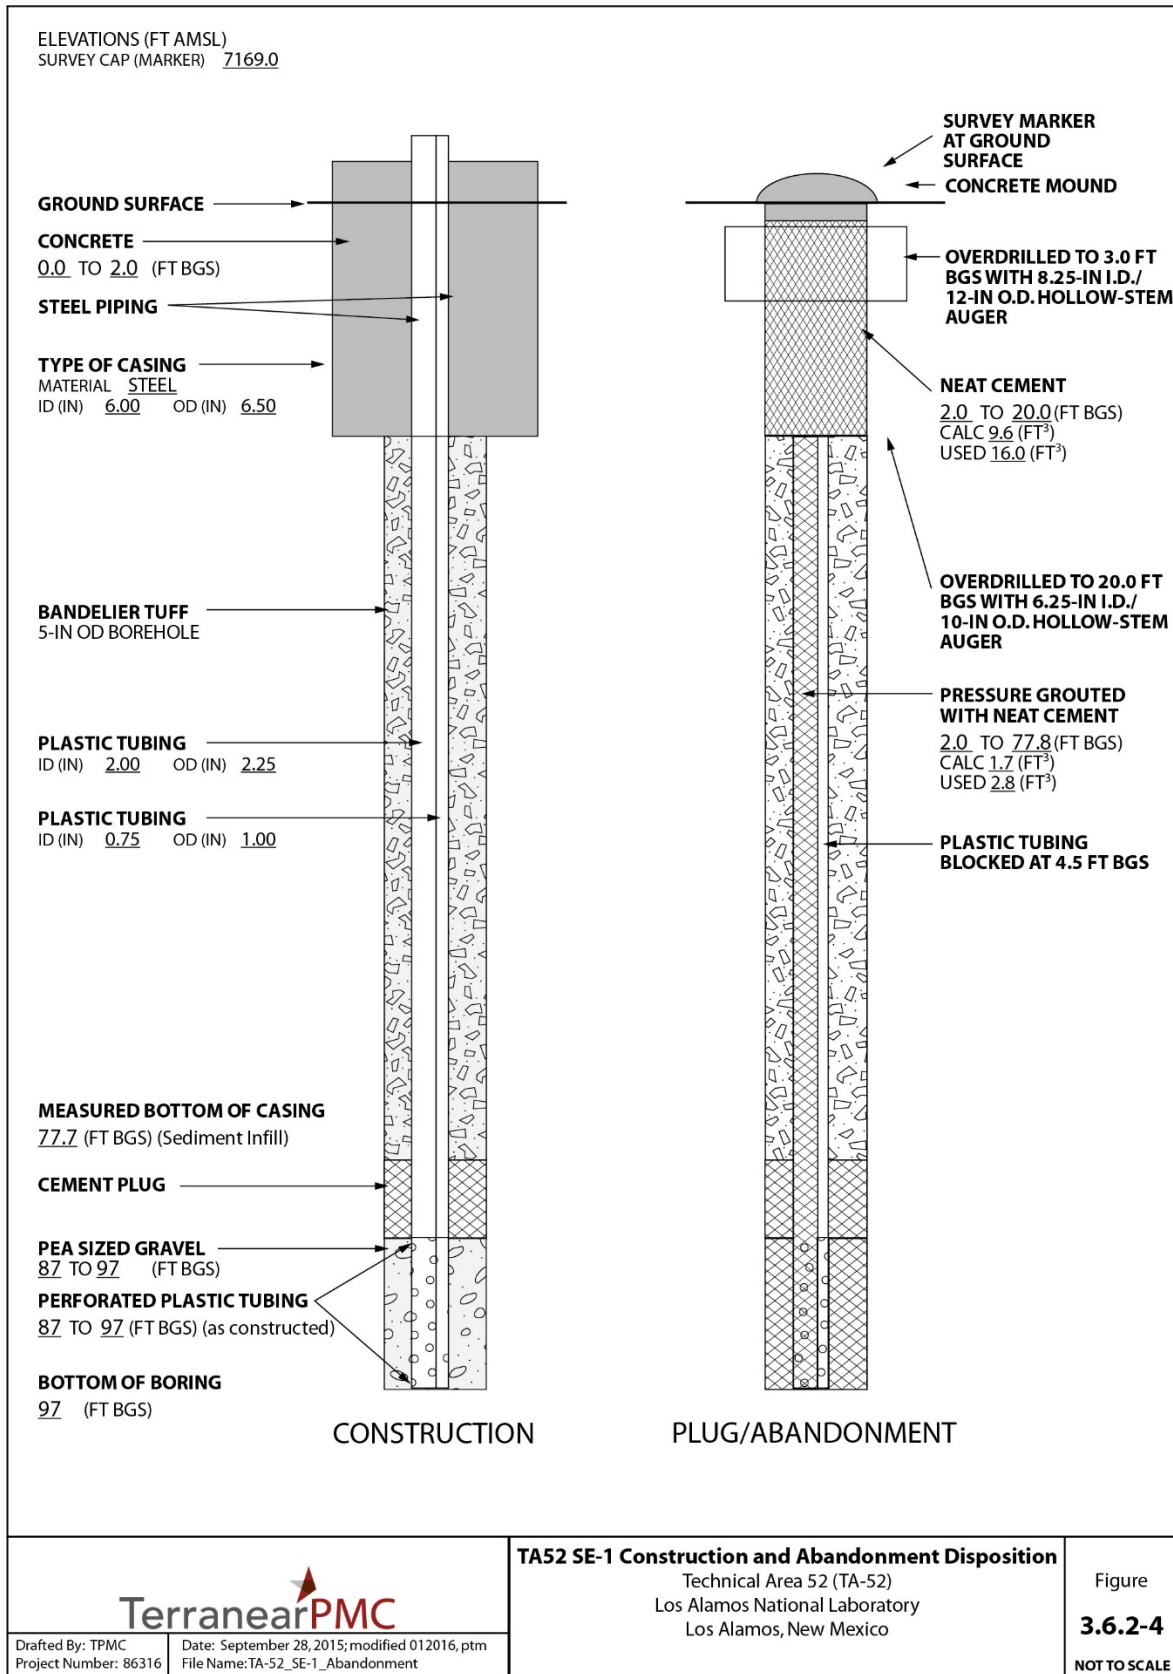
TA-52 Well SE-1 construction and abandonment disposition
